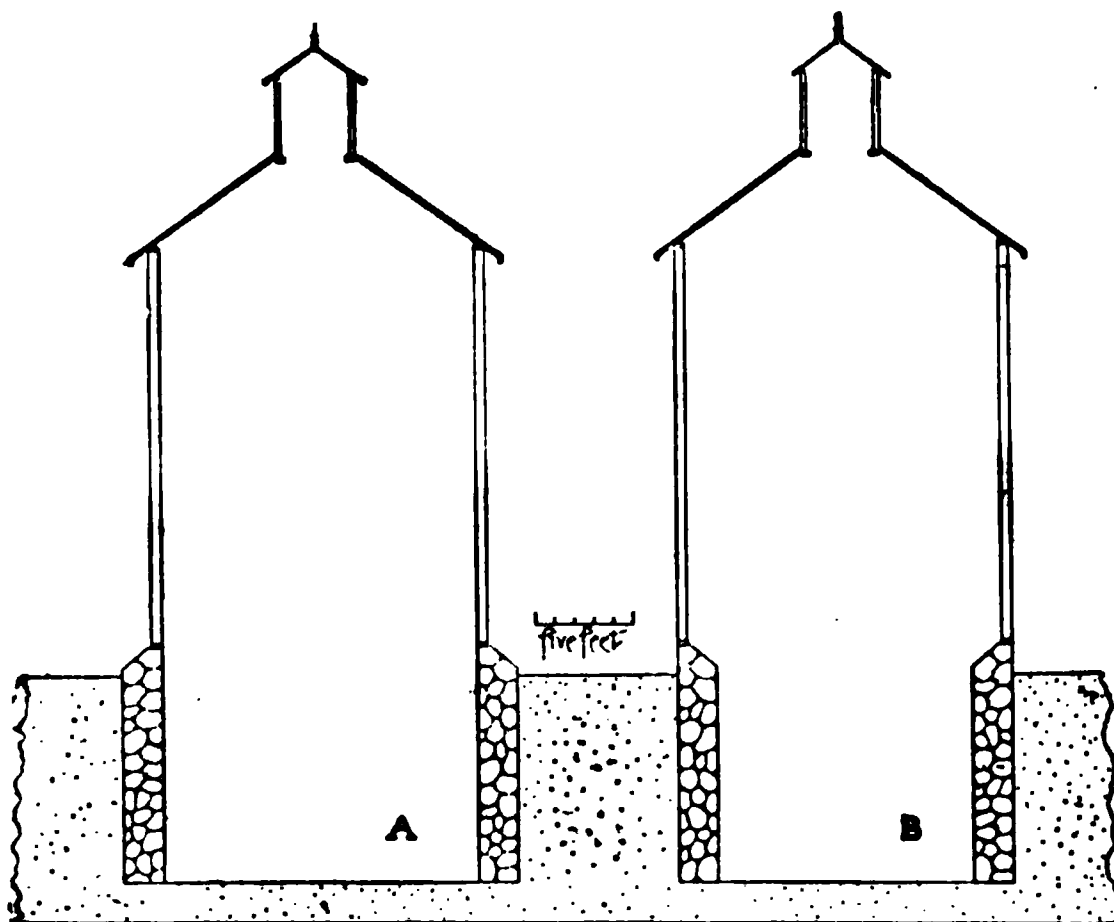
Showing two methods of placing the wood, brick lined or lathed and plastered silo on a stone foundation. A shows the silo set with upper portion flush with the inside of the stone wall, and B shows the upper portion flush with the outside of the stone wall.
